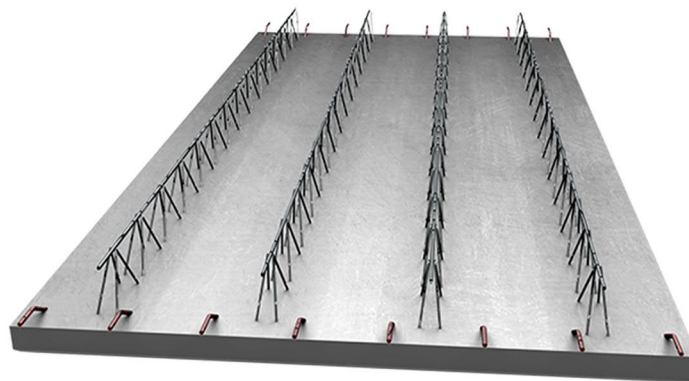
Filigree slab (Keegan Precast Ltd, n.d.)
